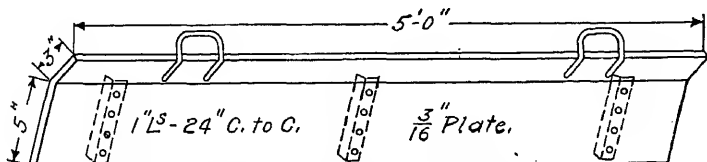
Sheet-Iron Plate for Giving Finish Surface to Concrete
